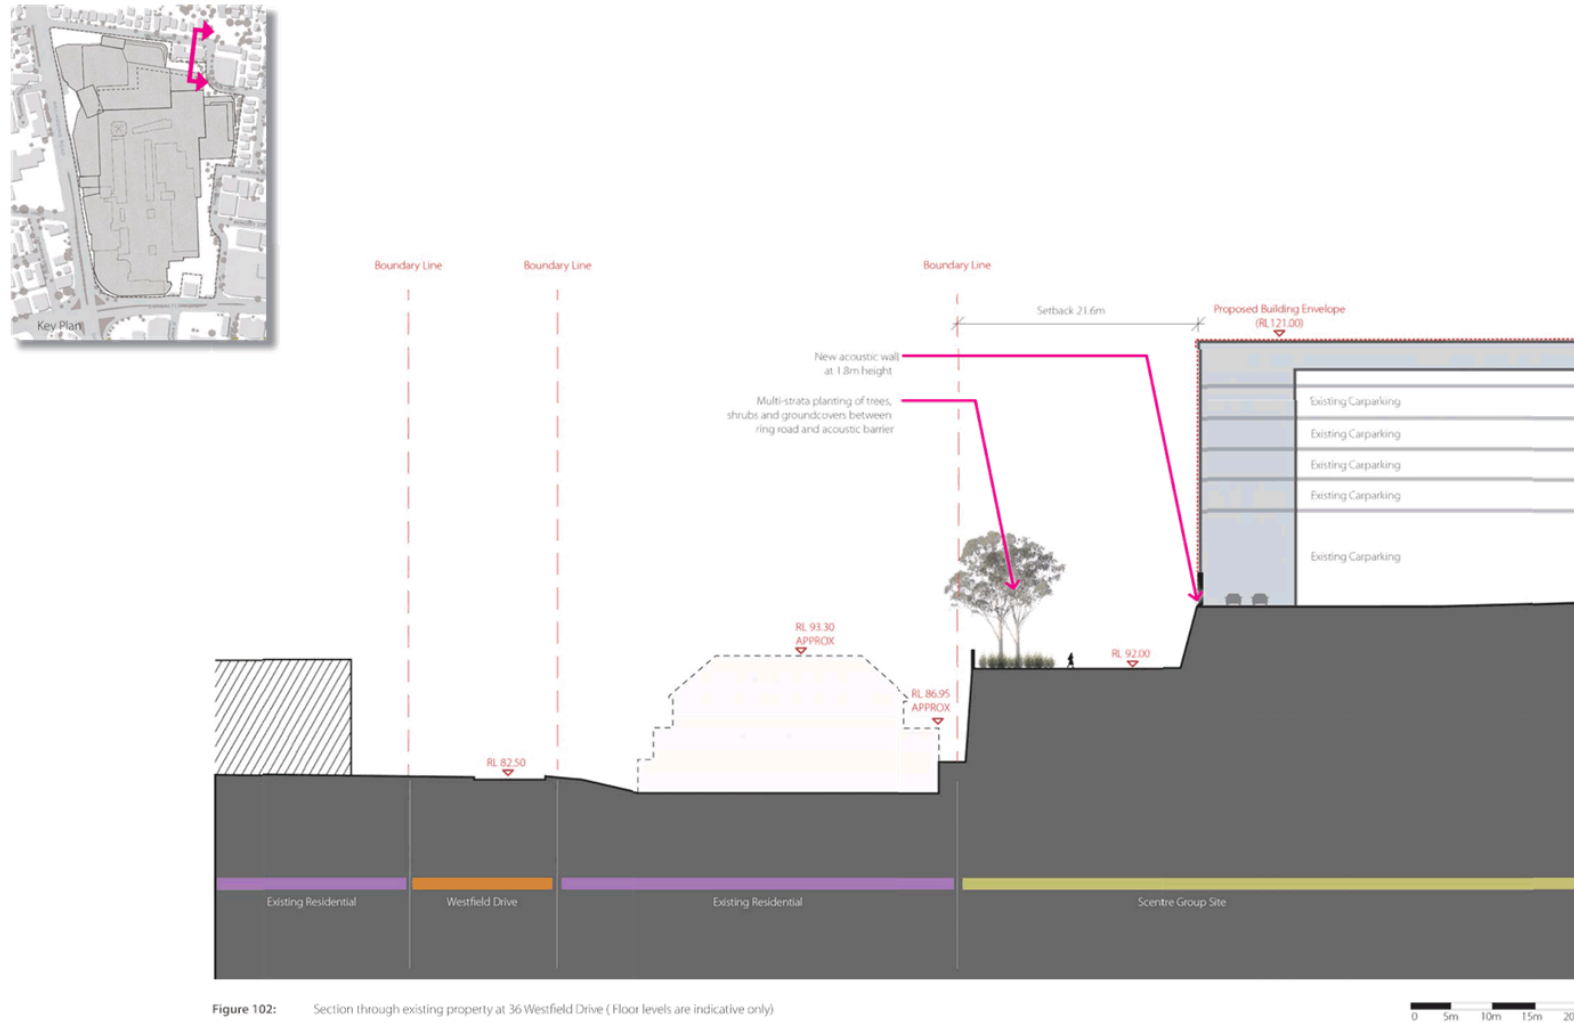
Section through existing property at 36 Westfield Drive (Floor levels are indicative only)
